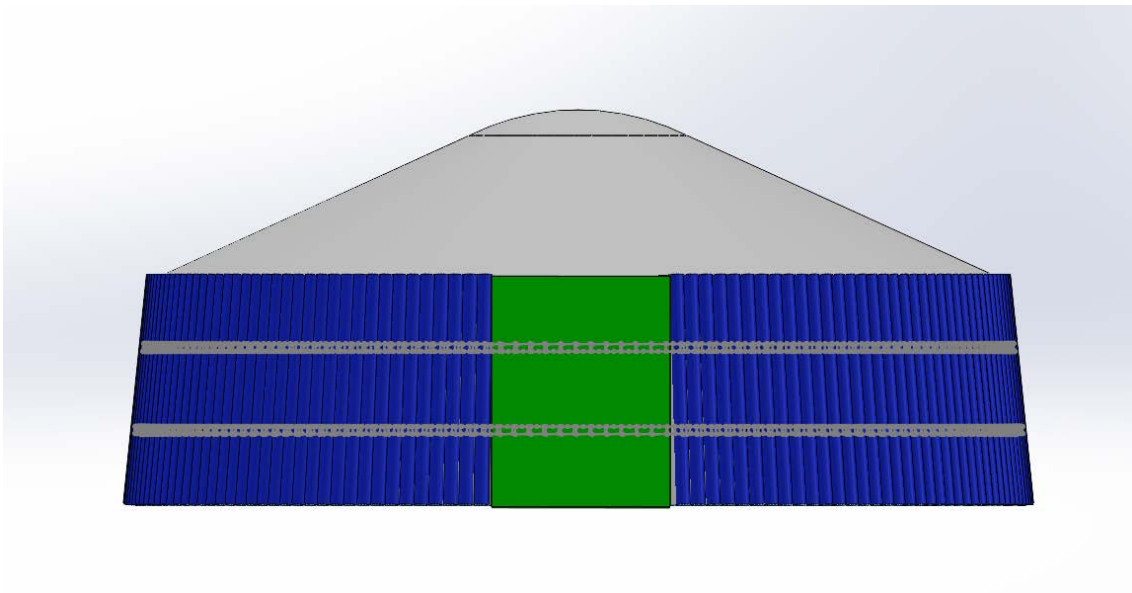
Constructed design of the wall insulation in SOLIDWORKS
